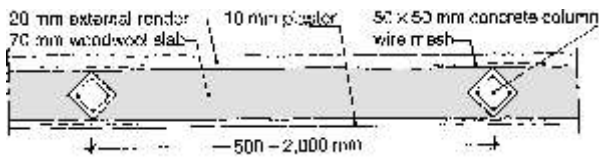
Wall of vertical (or horizontal) woodwool slabs with V-shaped ends. The slabs are joined by columns of in-situ cast concrete. (Using 70 mm thick woodwool slabs gives a U-value of 1.0 W/m²K).
